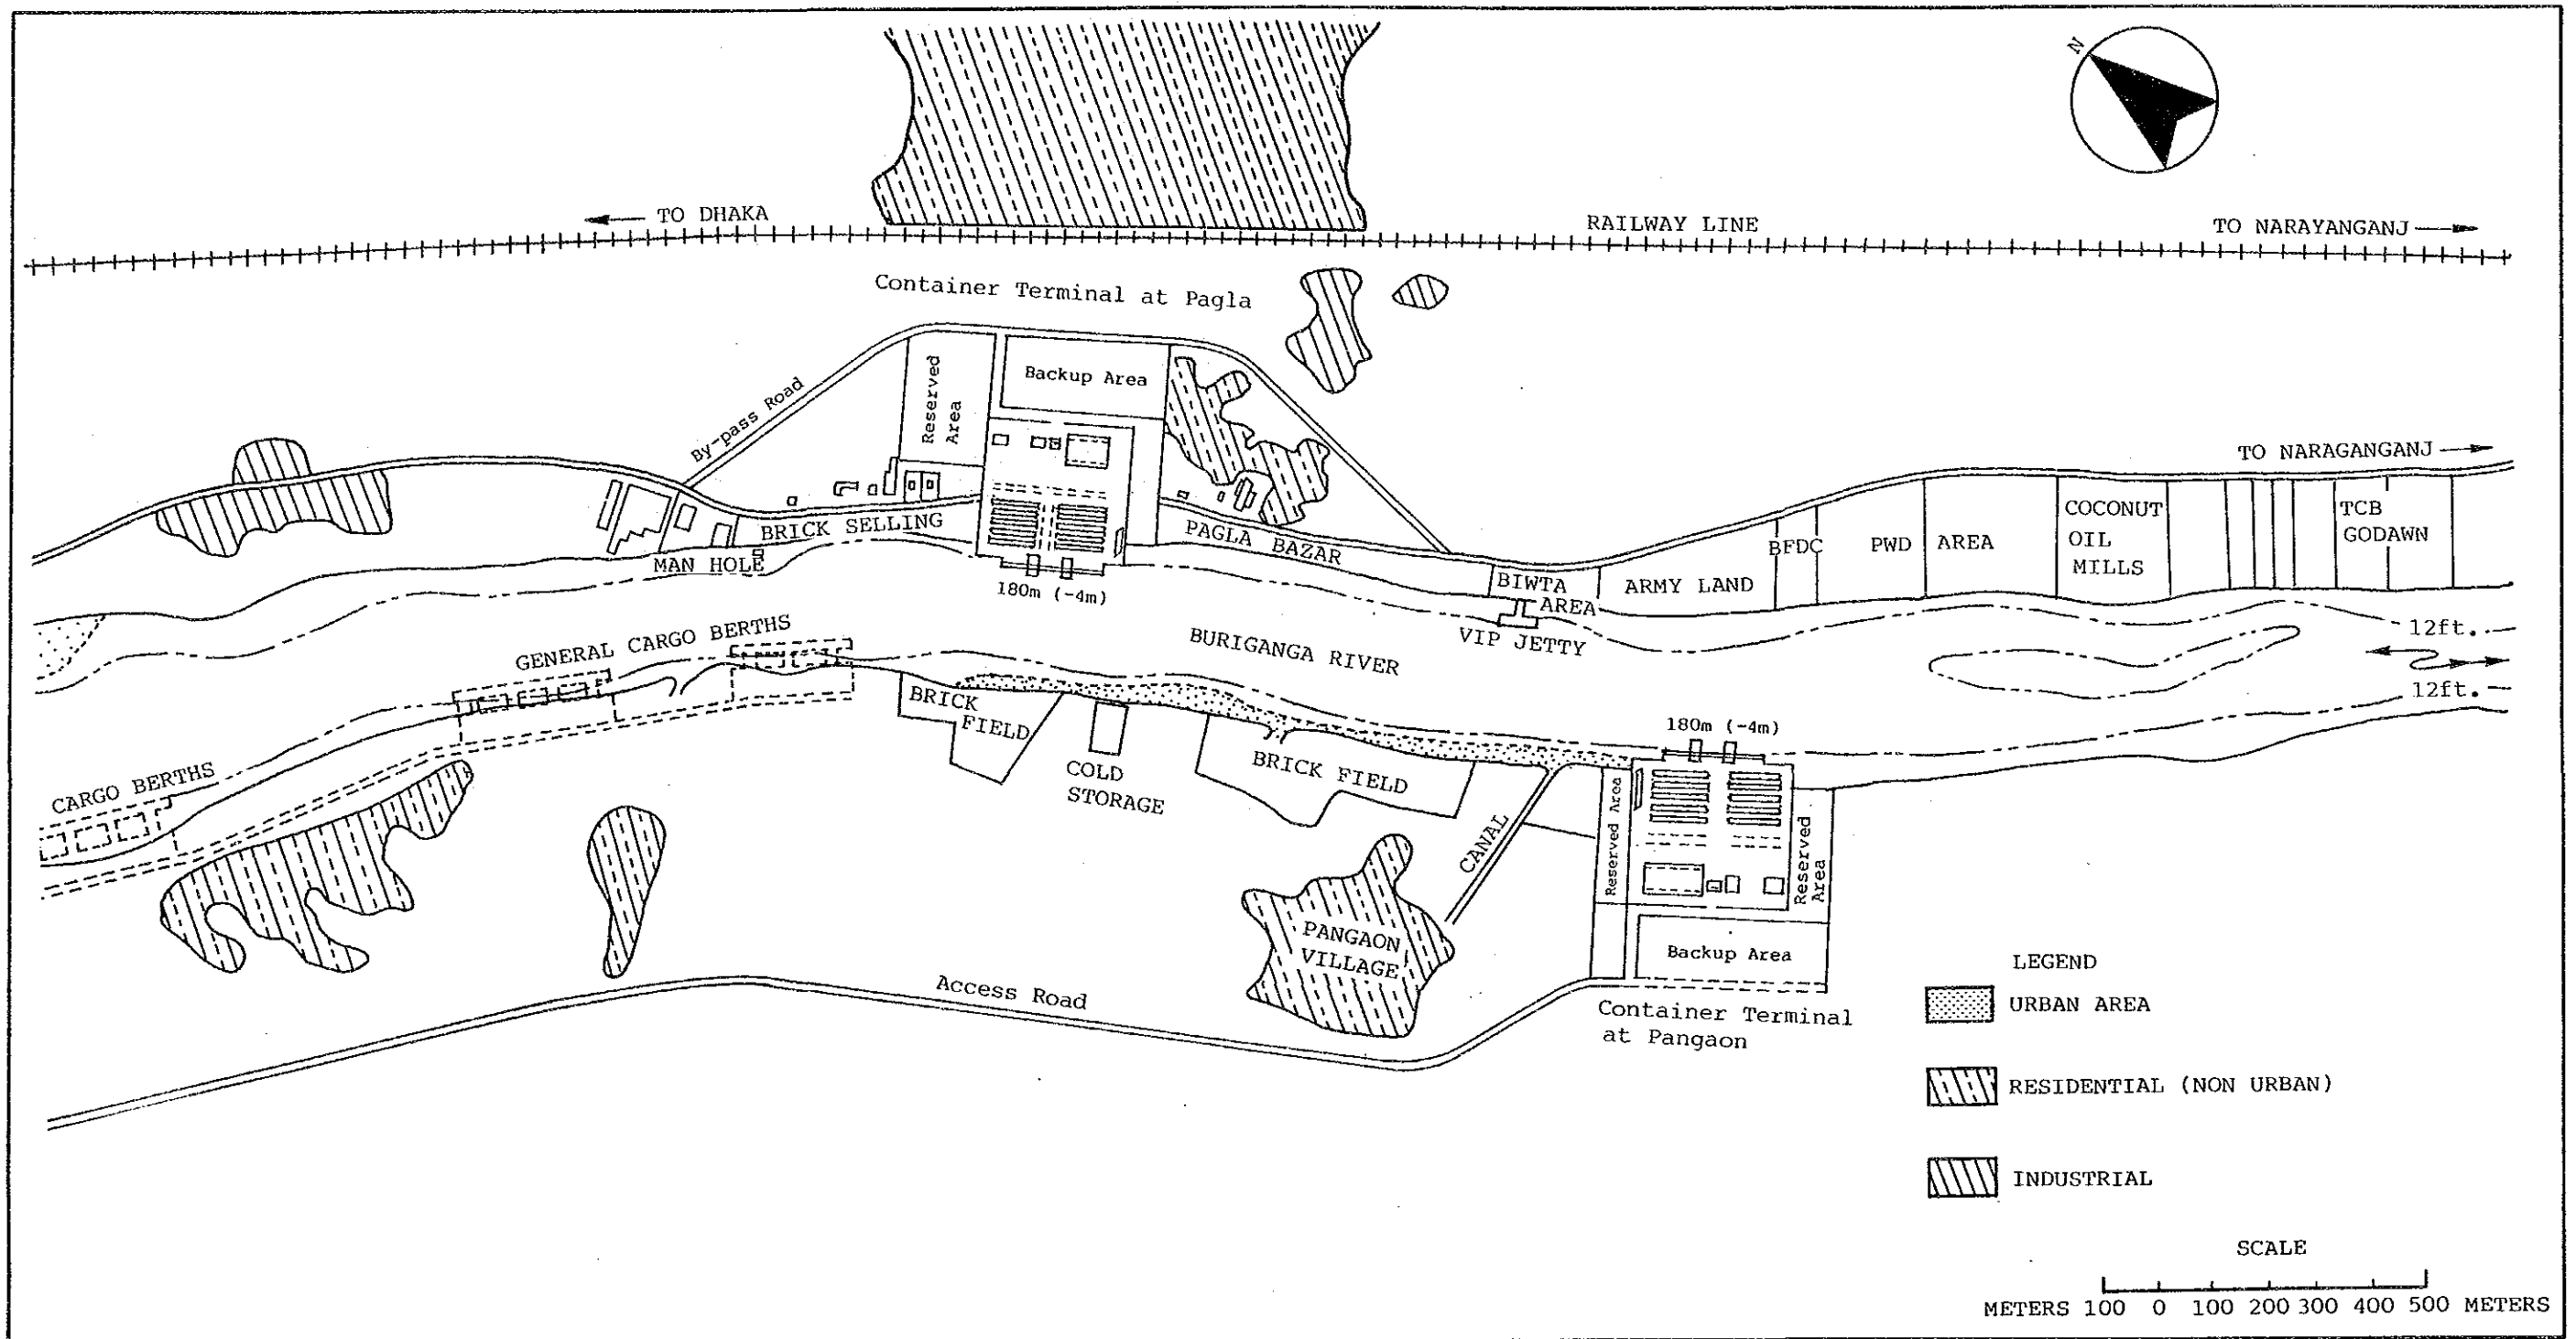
Alternative Development Plan at Pangaon and Pagla Site - Case 4
